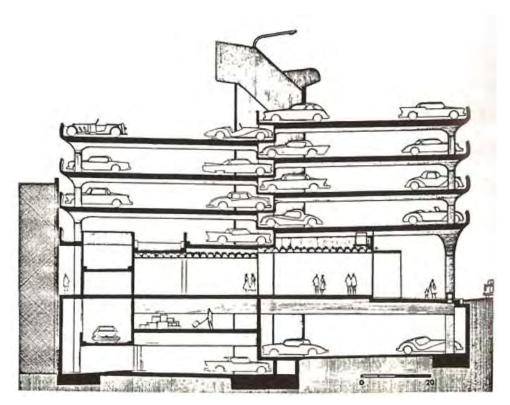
Section drawing illustrating the department store (at left), interlocking parking levels, ground level commercial use, and below-grade garage space for hotel use (Metz 1966, p. 64).
